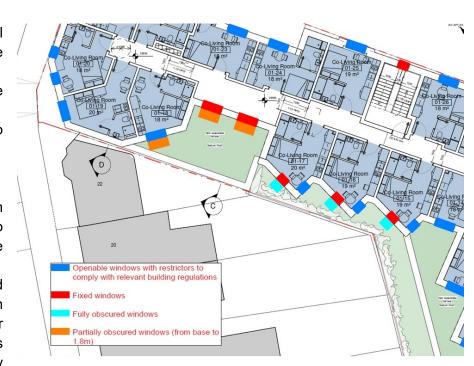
Image showing proposed windows closest to Hawthorne Road properties.
